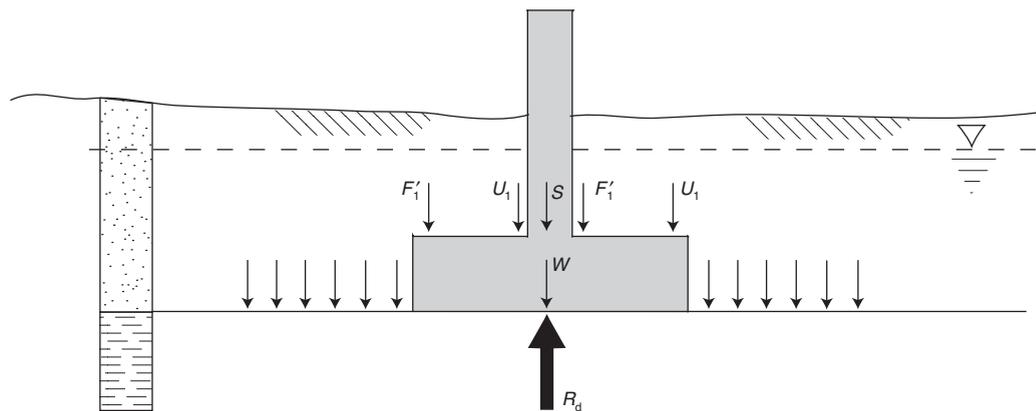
Footing with hydrostatic water pressure in granular soil over undrained clay. (After Simpson and Driscoll, 1998.)
